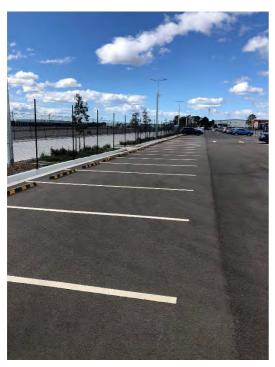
View to east showing existing landscaping corridor, mature tree spacing, and car parking bays within Area 1
